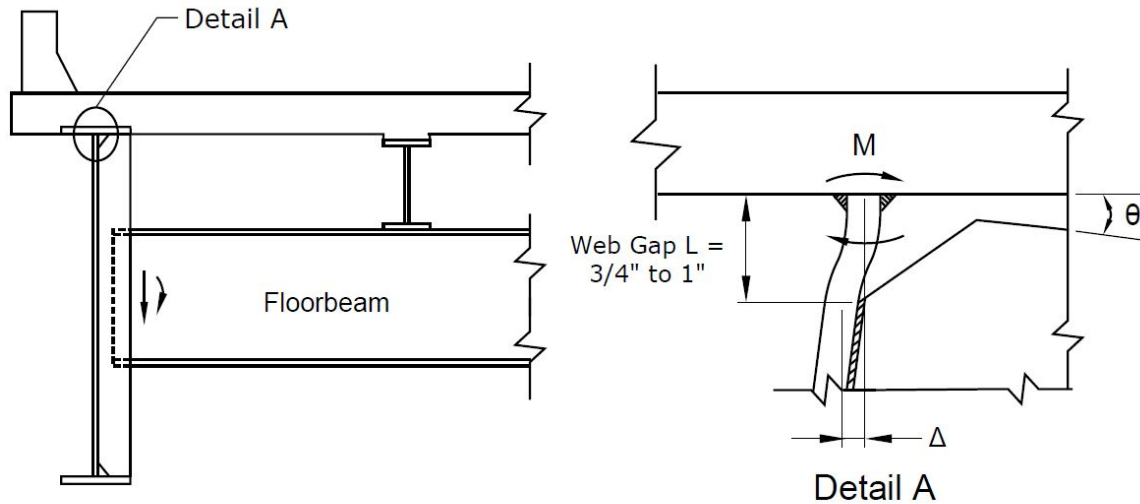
Out-of-plane bending at connection between floorbeam and girder.
